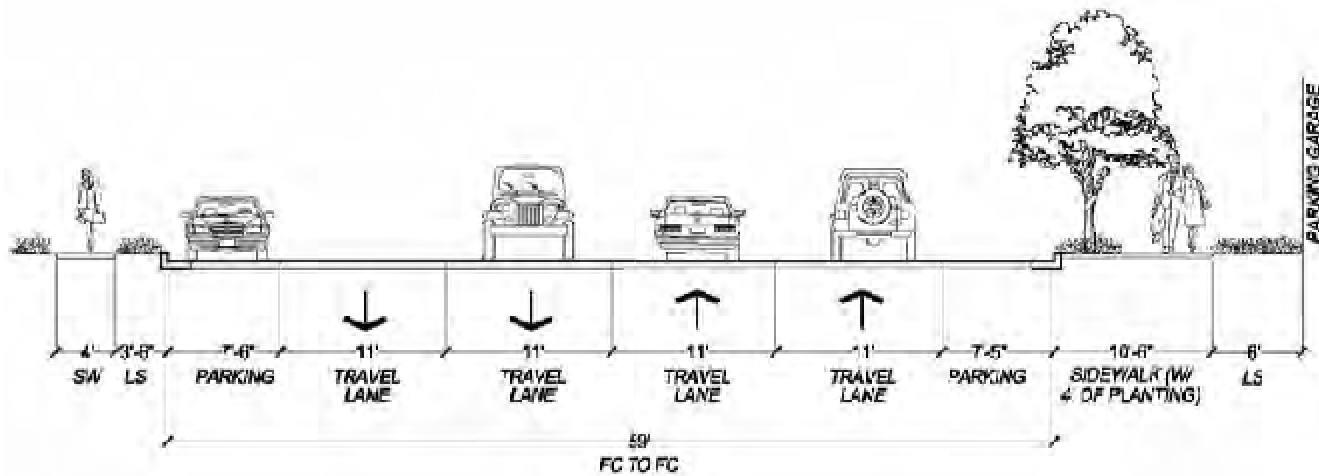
Existing cross-section of S. Eads Street between 20th Street S. and 23rd Street S.
